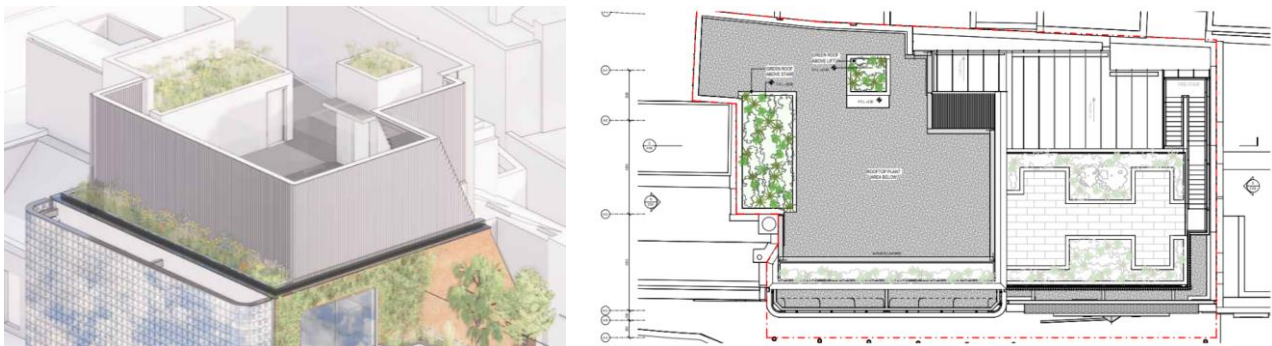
Urban greening at roof terrace and the south façade of 38-39 and 40-41 Furnival Street.
